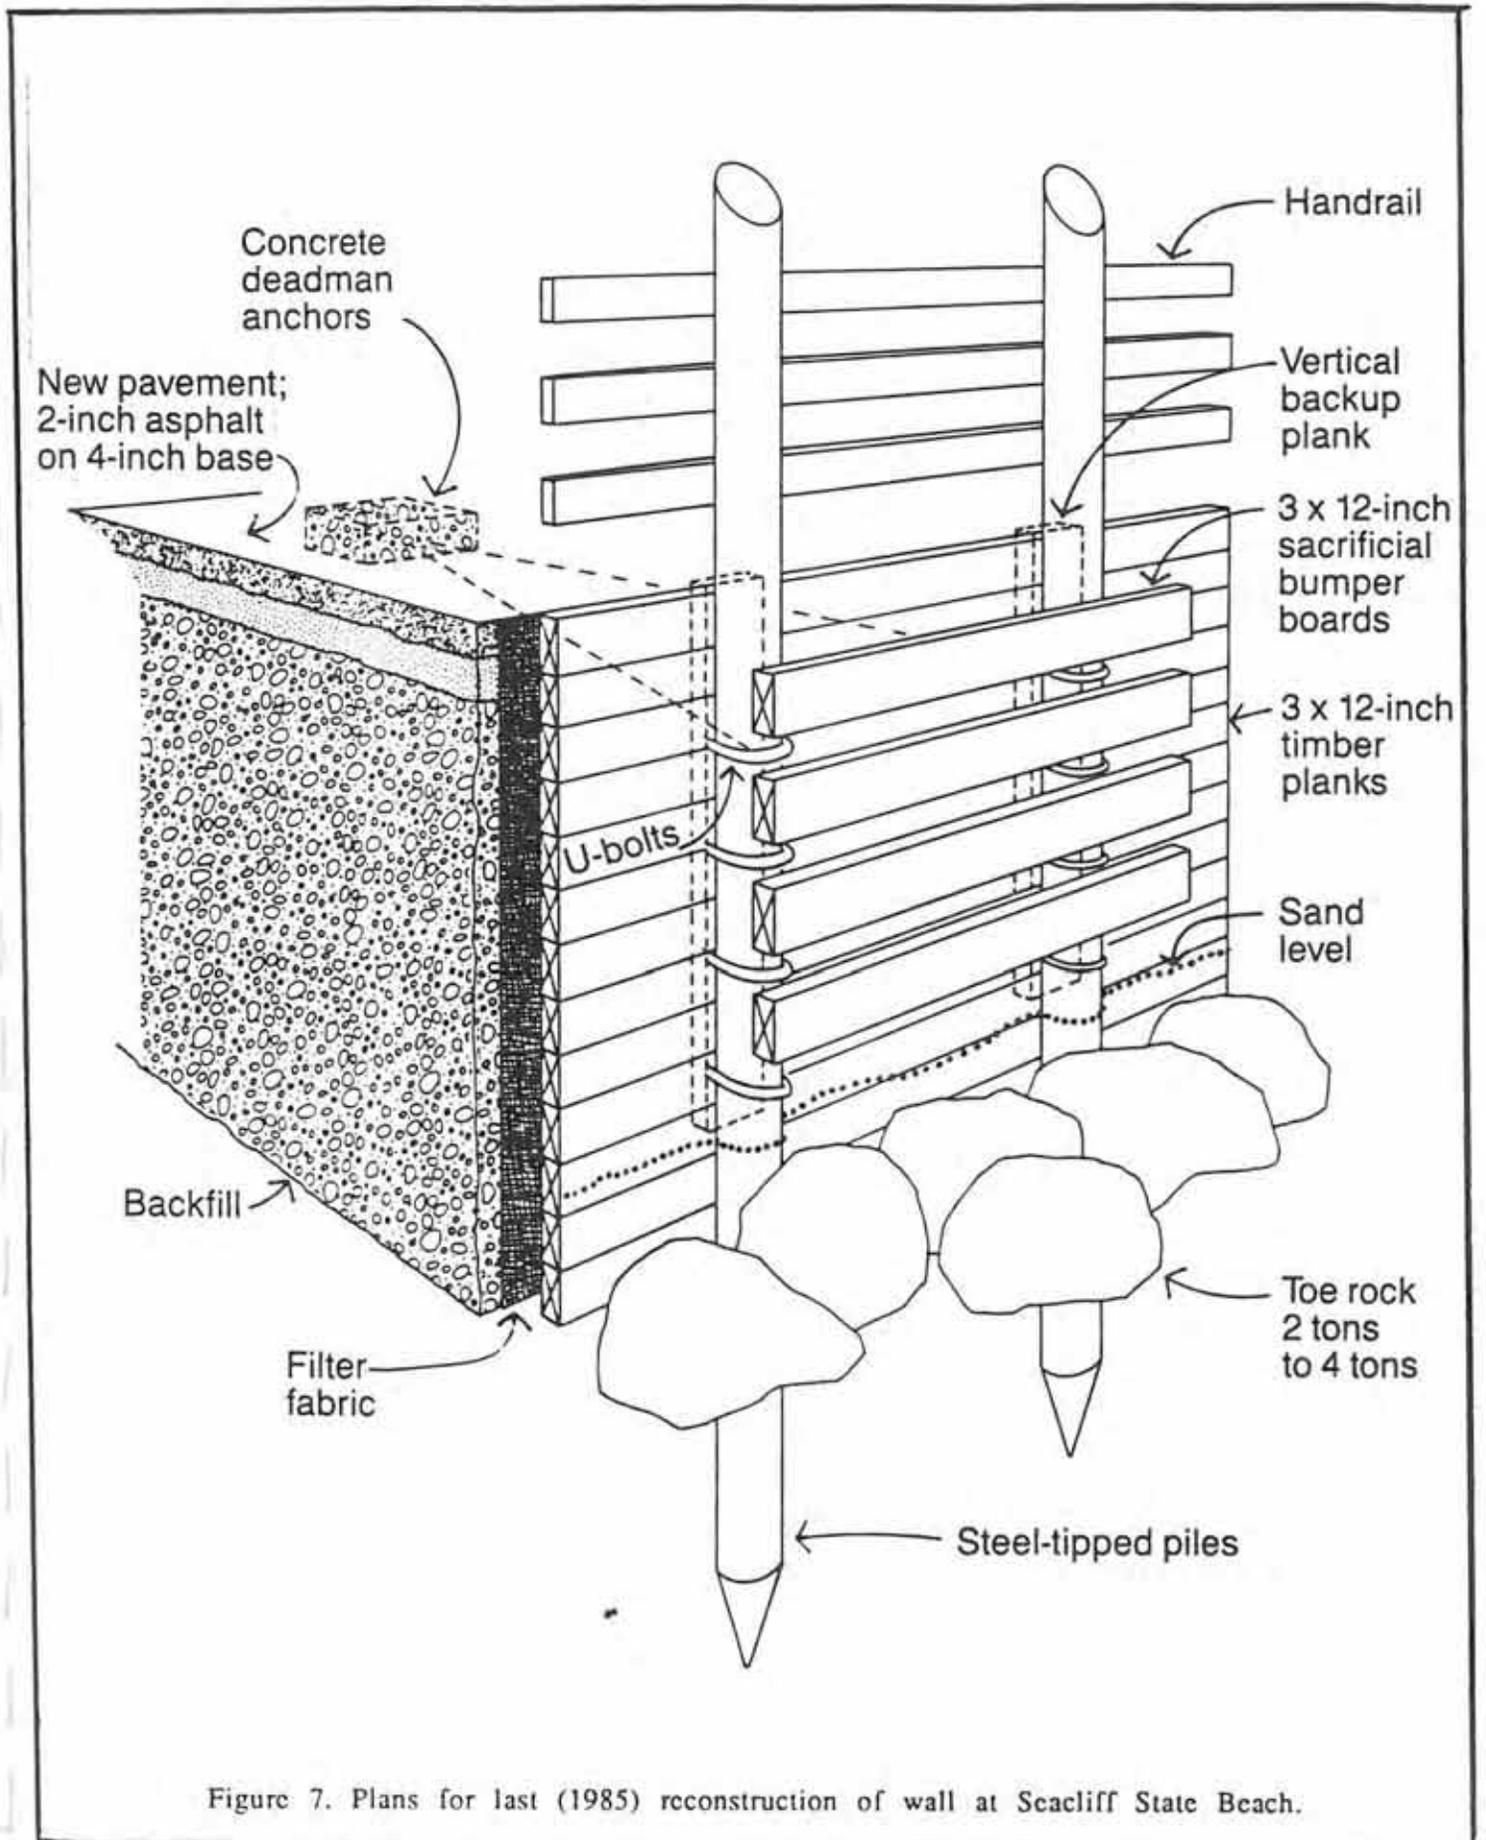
Plans for last (1985) reconstruction of wall at Seacliff State Beach.
